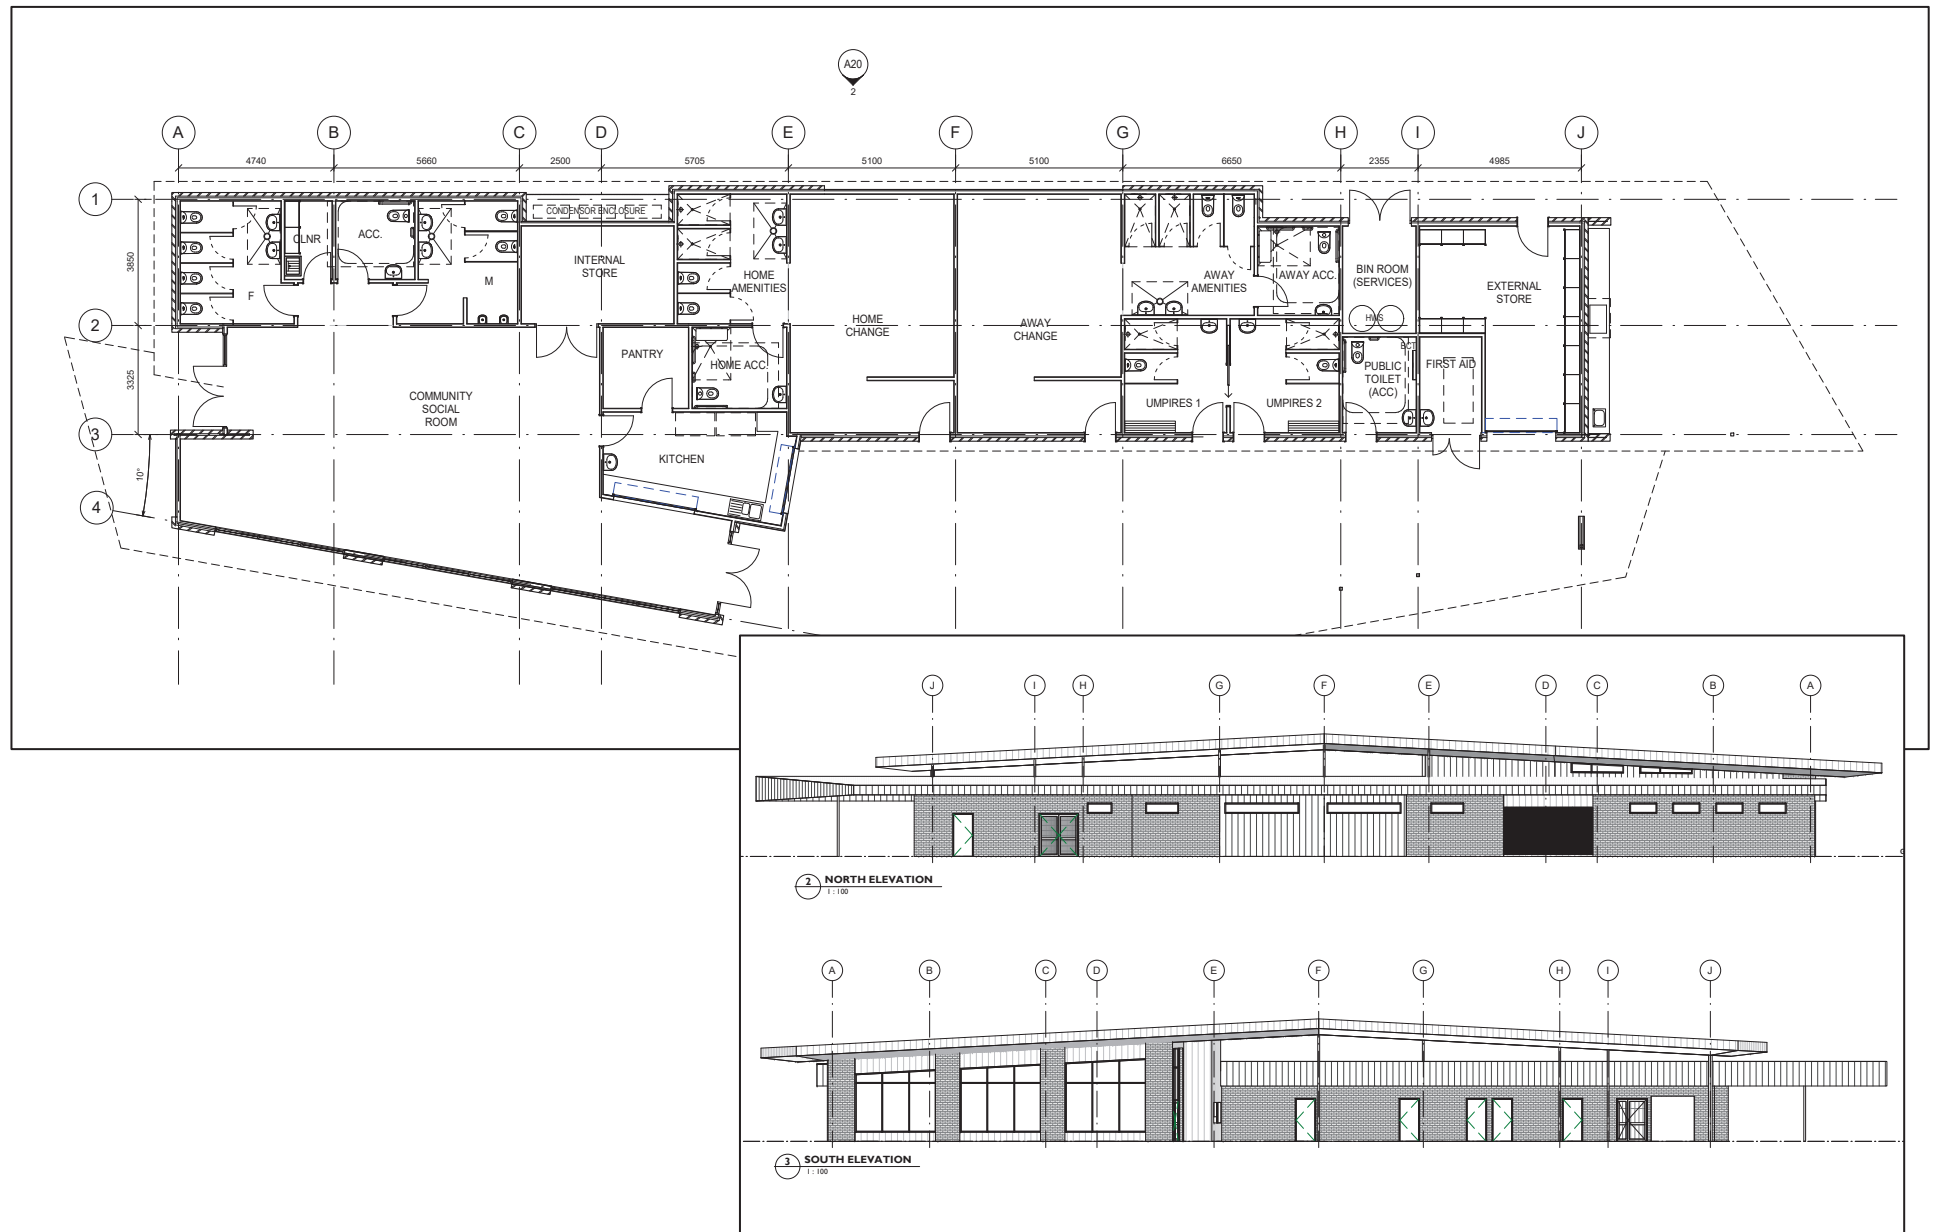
Brookdale Road Reserve Pavilion (proposed concept only and subject to change)
